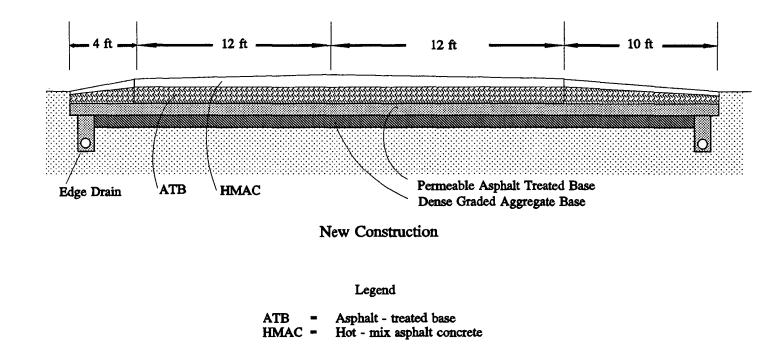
A test section with an asphalt concrete base and drainage provisions.
